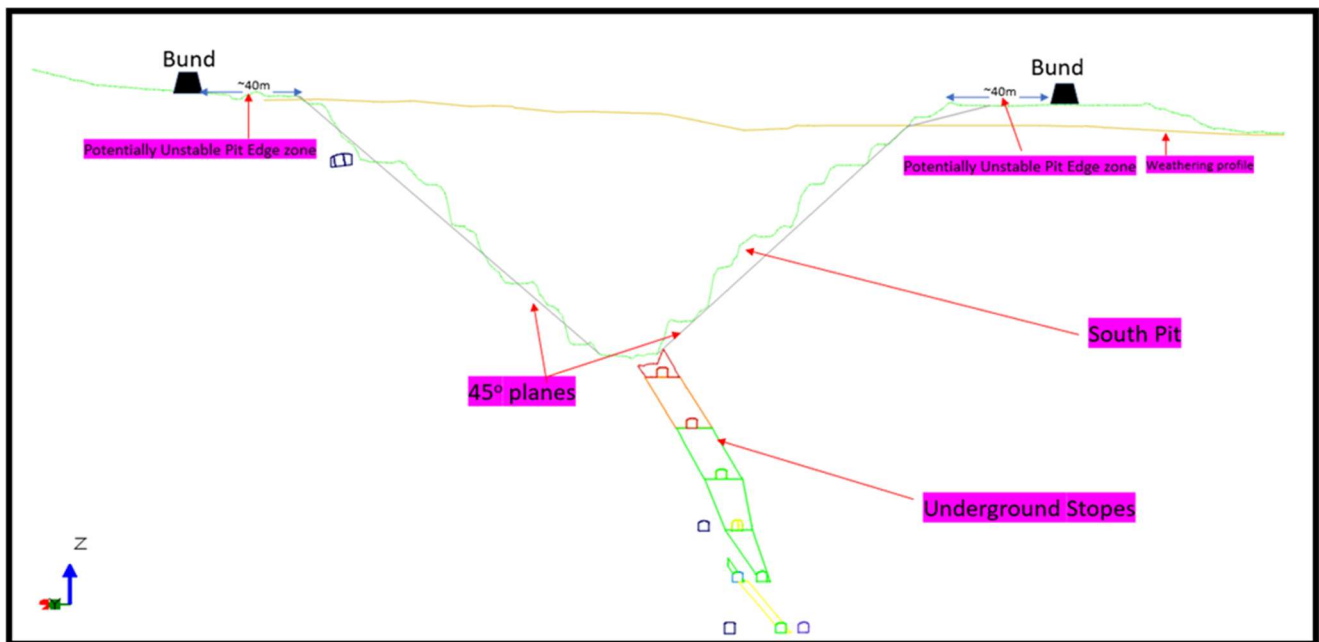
Barbara South Pit and underground stopes showing potentially unstable pit zone
